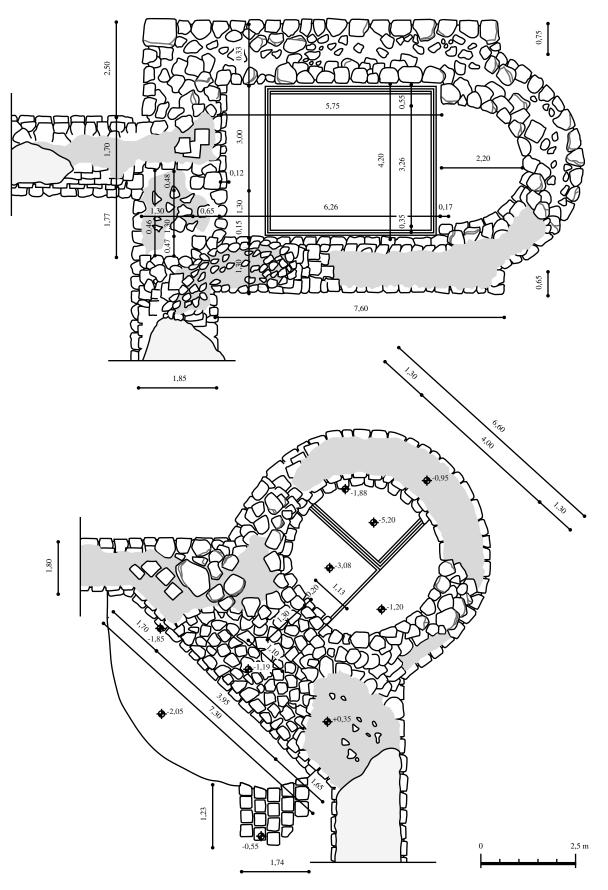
Saldum: a) northeastern tower, plan; b) southeastern tower, plan
